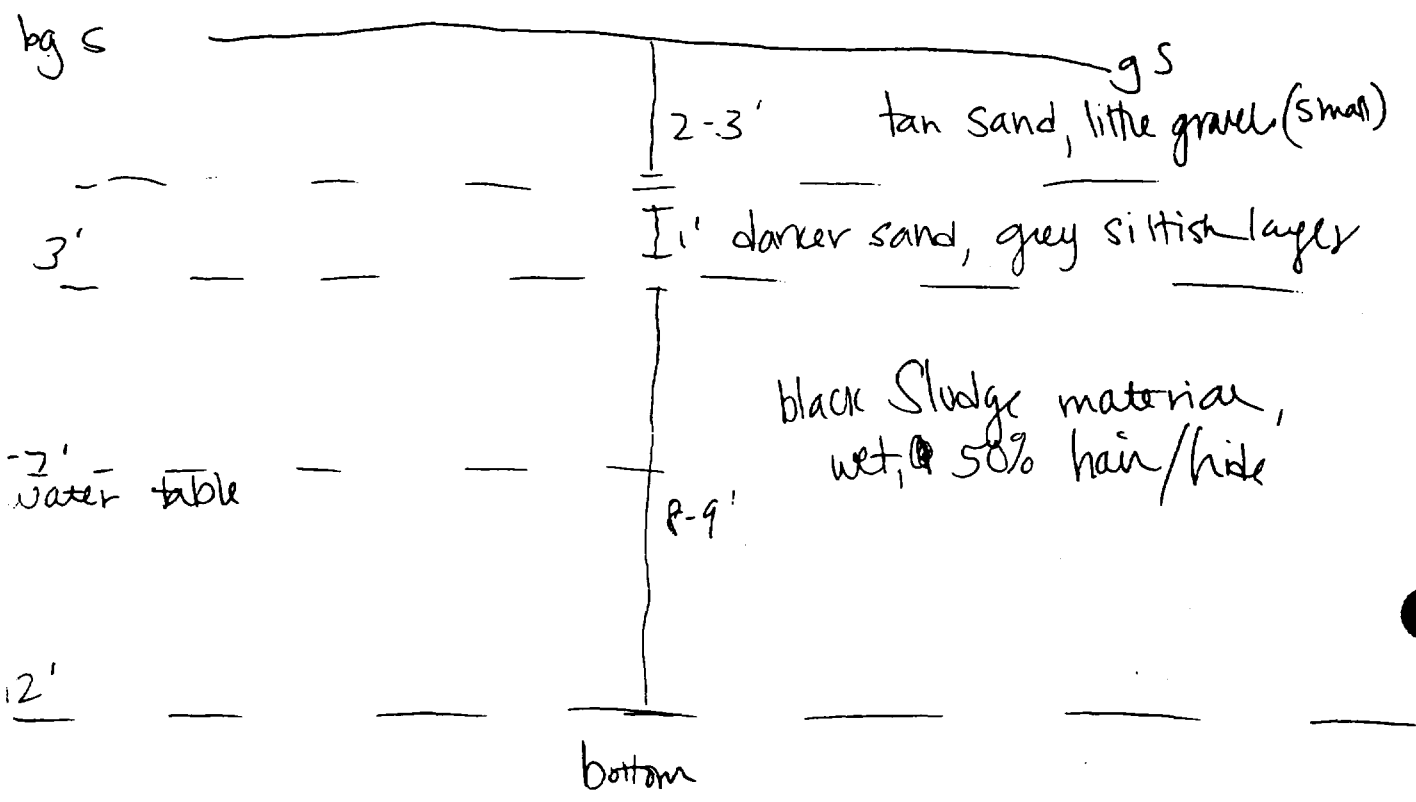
PHOTO LOG: Roll #2 TEST PIT: TP-2-10
